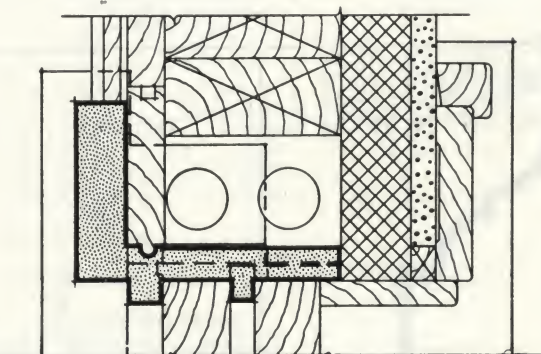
Inside liner removed and special 1 1/2" insulation and plaster base extended over edge of pulley stile.
